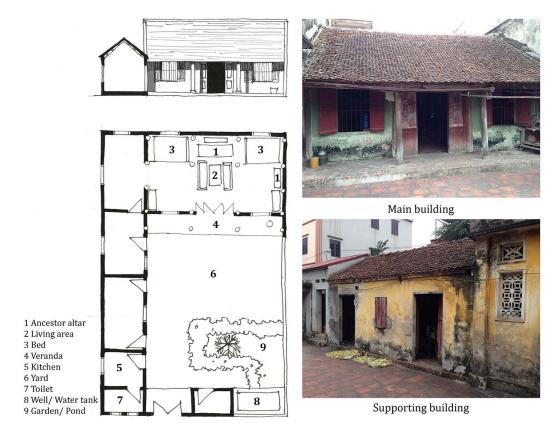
Example of one existing traditional house in a village locating in outskirt of Hanoi (Drawing and images by author in 2016)
